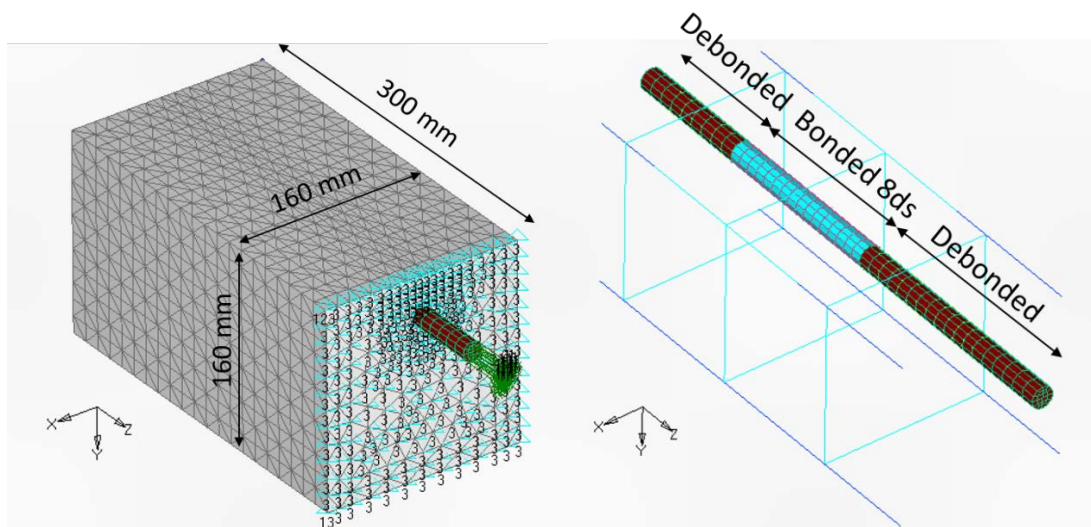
Model constraints and forces (left) and model rebar and reinforcement disposition (right).
